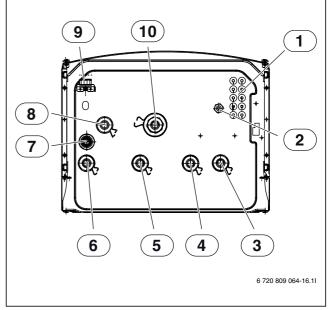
Pipework for heat pump module with mixing valve for external booster heater
